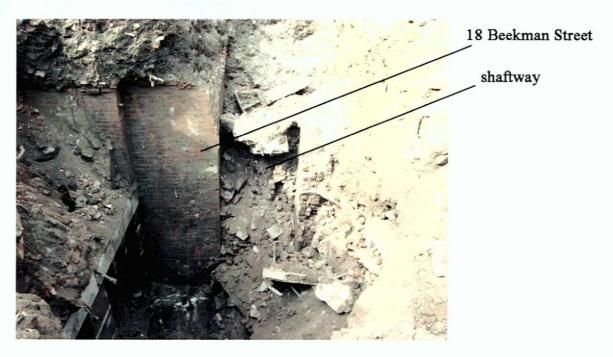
View of trenches 1 and 2, looking at the northeast corner of 18 Beekman Street and the shaftway between it and 8 Spruce Street; the back wall of 20 Beekman Street is on the lower left.
